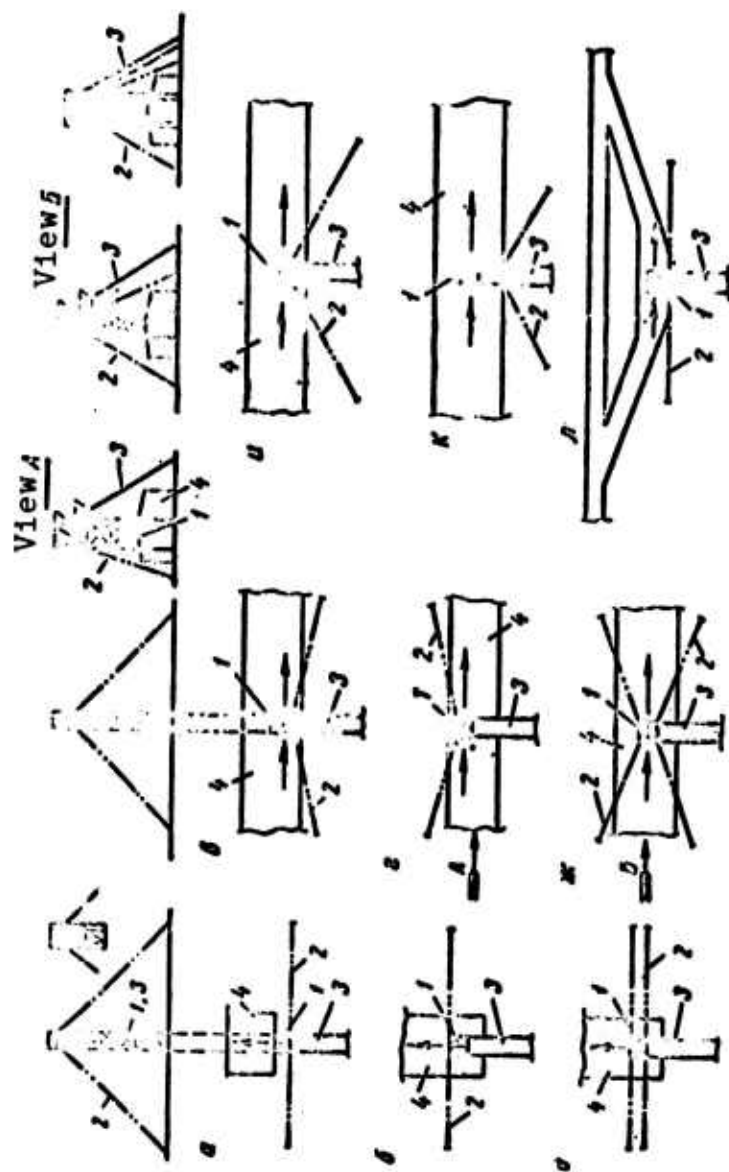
The diagram of the arrangement of transverse steel stretching of flat pile drivers: 1 - machine mount; 2 - stretching; 3 - a boom; 4 - deckhouse building.
